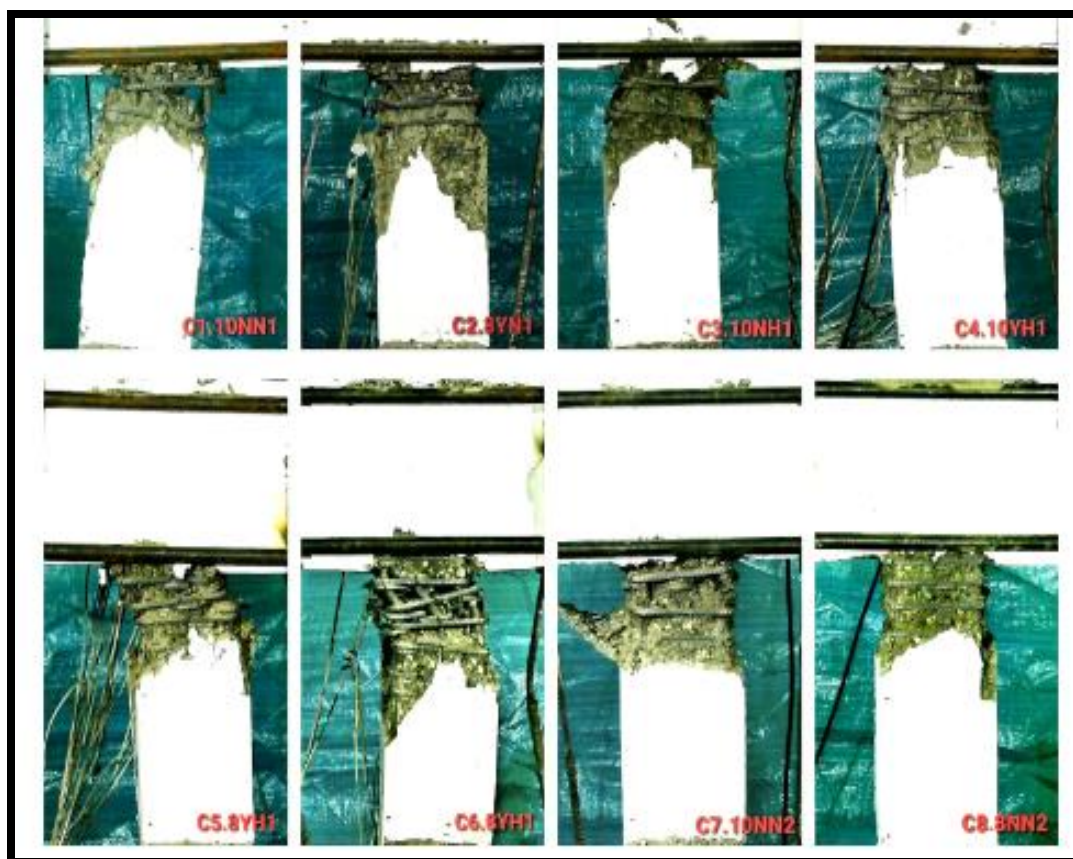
5. The final damage photos in the central part of specimens (Taheri et al. (2020))
